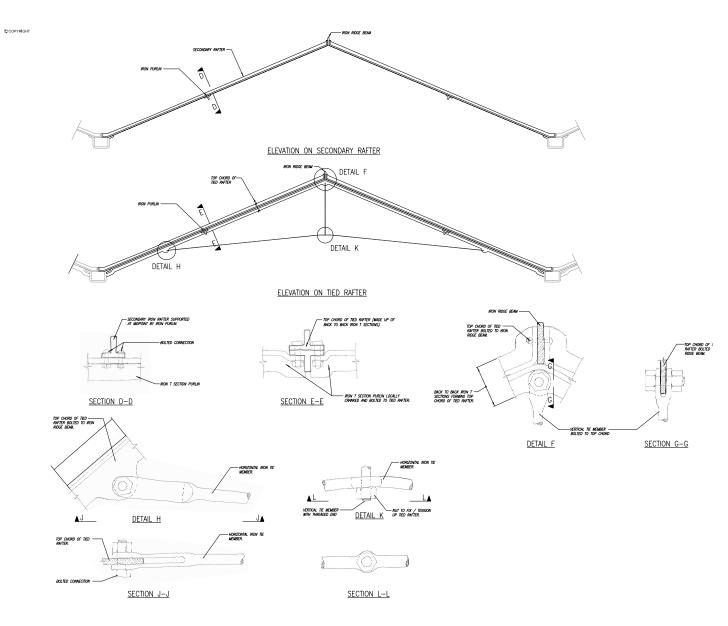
Sketch drawing from observation of existing 1857 and 1883 canopies on platforms 1 showing roof details
